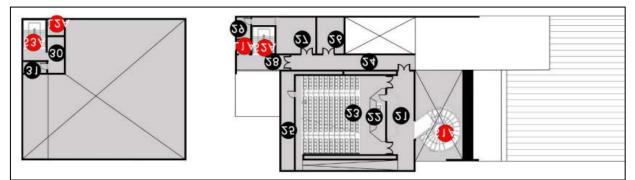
Re-drawn first floor plan (Source: CREW - Cremonesi Workshop (2015)).
